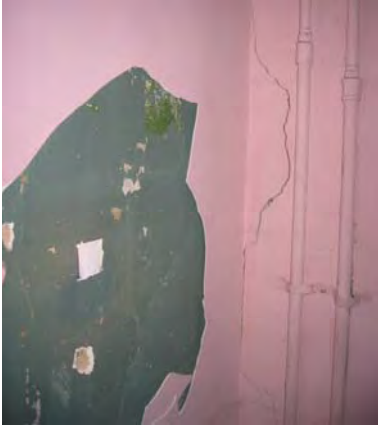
Plaster damage at west wall. (Photo: BBB, 2007)
